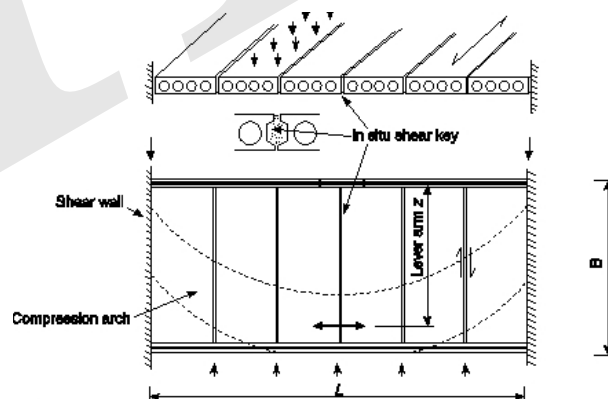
Resistance to horizontal forces in a precast diaphragm.
